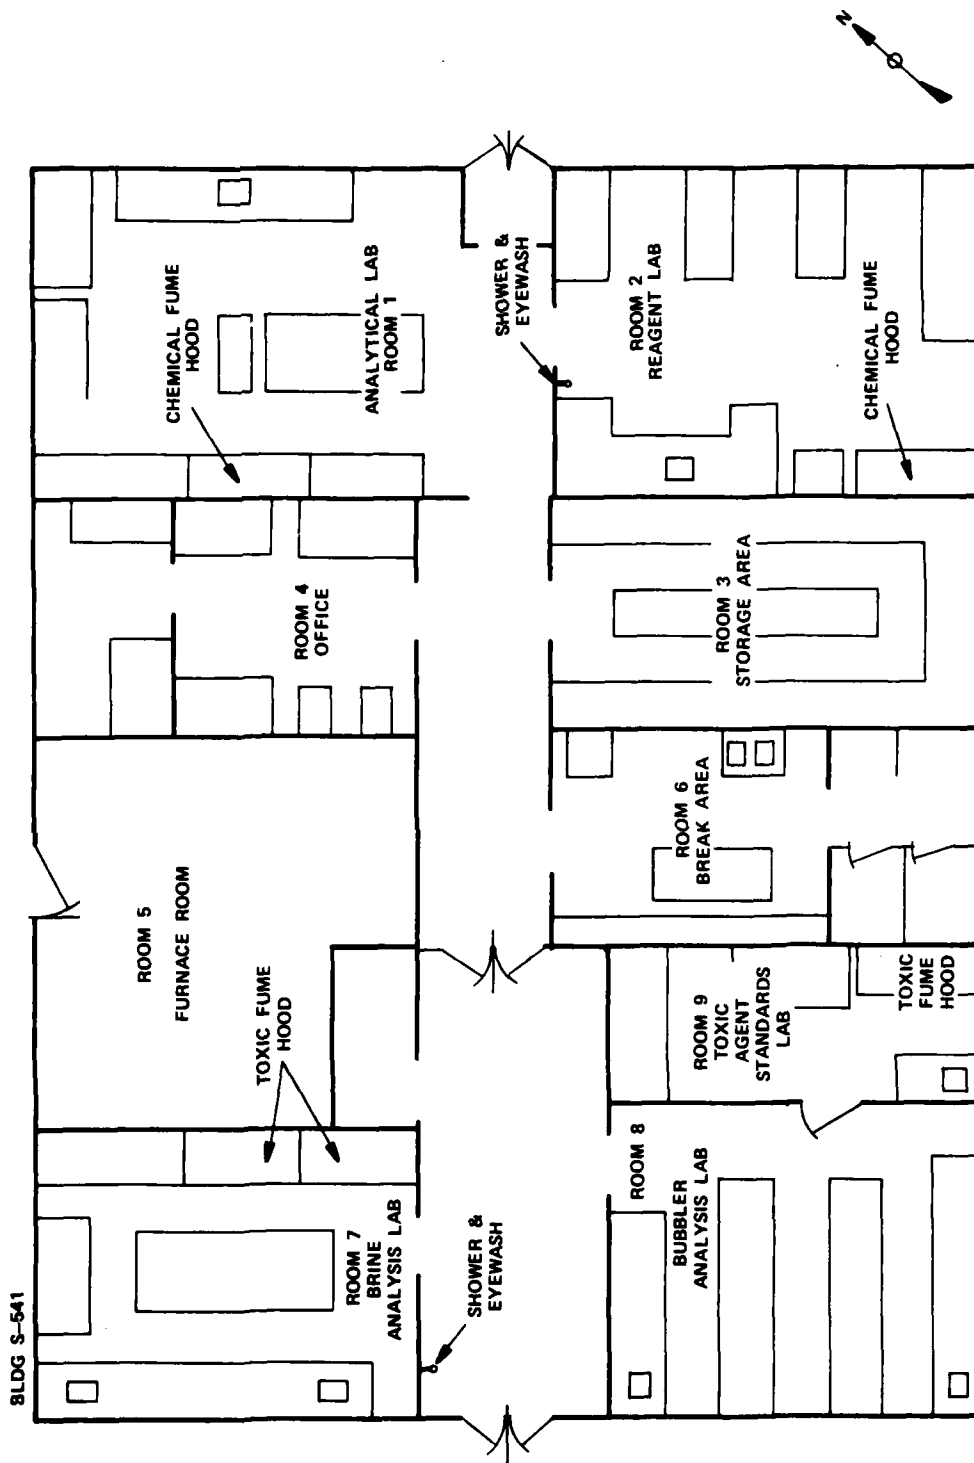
FLOOR PLAN OF CAMDS CHEMICAL LABORATORY
